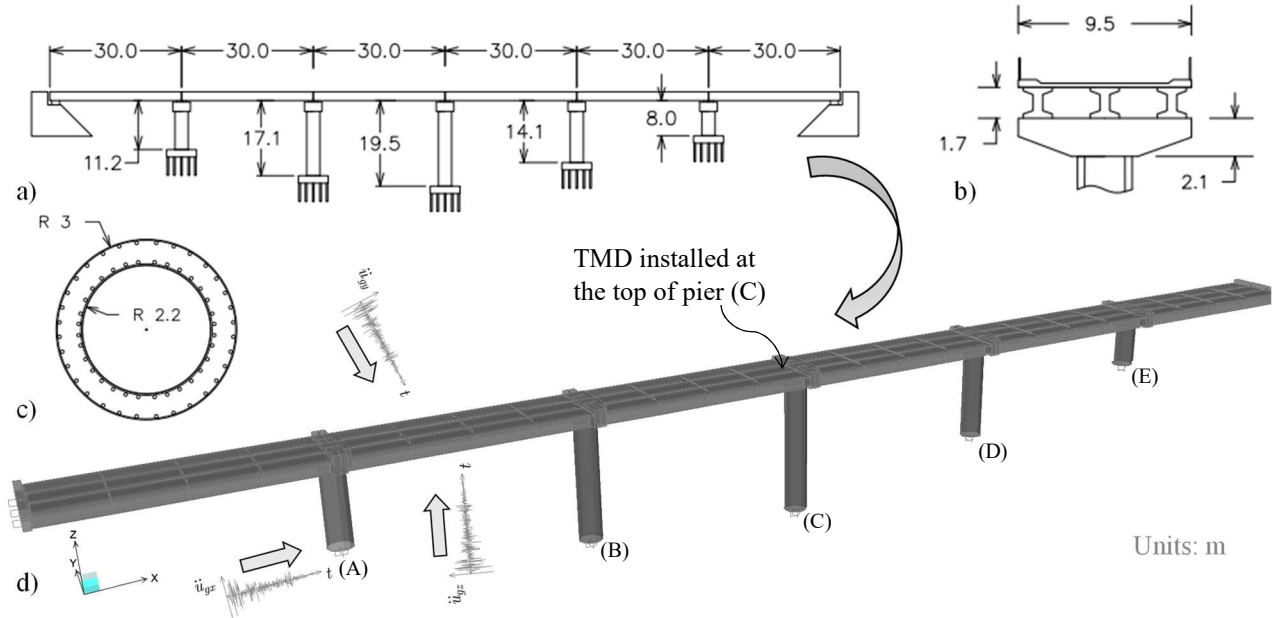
Geometrical data of the beam bridge: a) elevation view, b) deck cross section, c) pier cross section, d) finite element model.
